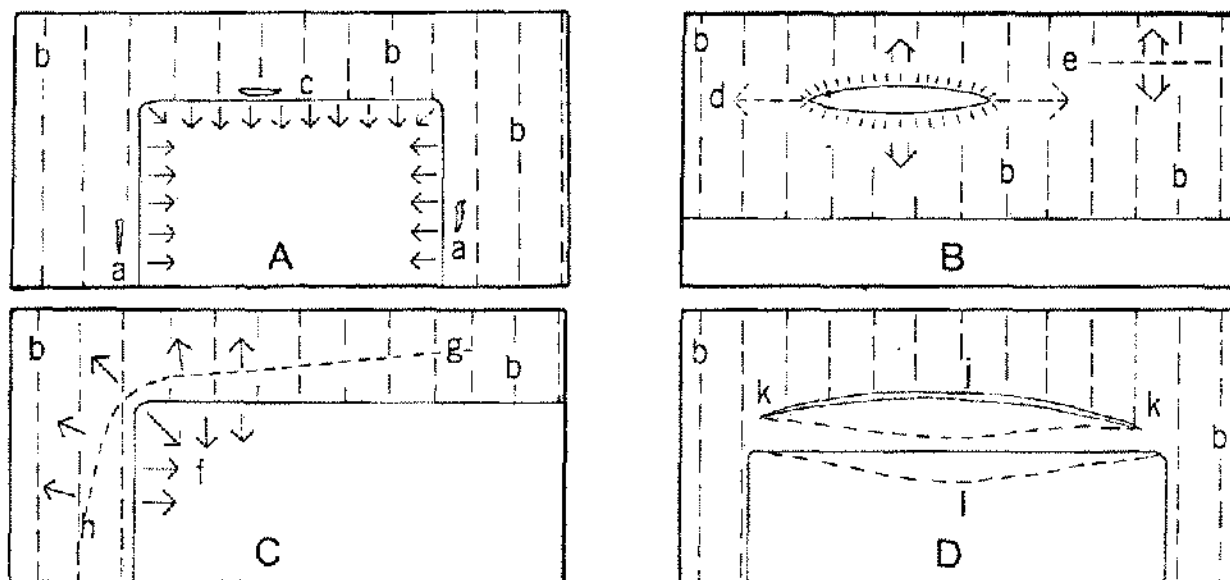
Diagrammatic cross section of typical salt working shows development of exfoliation joints and ceiling slabbing. Openings are greatly exaggerated. Both bedding (b) and joints (a, c, d, e, g, h) develop perpendicular to the plane of the sketch.
